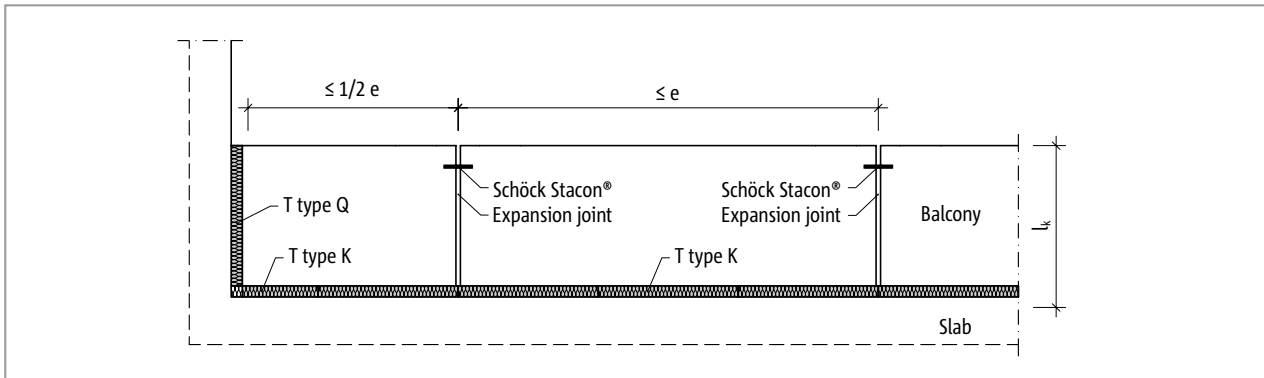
Schöck Isokorb® T type K: Expansion joint layout
